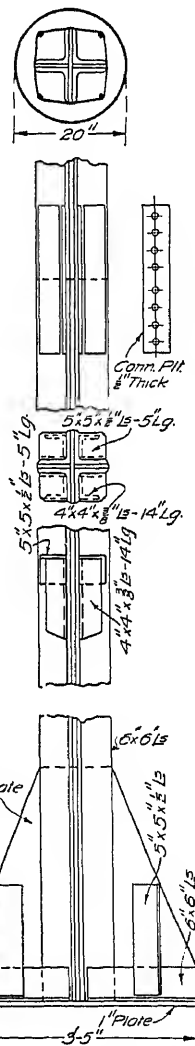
Steel Column Core for Buck Building, Philadelphia, Pennsylvania
